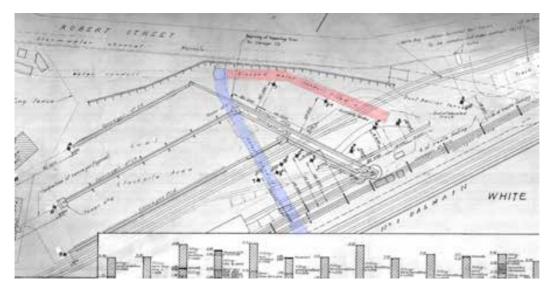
Extract of 1951 plan of Coal Loader with the old inlet canal shown red and the 1951 shown blue connecting to the northern penstock.
